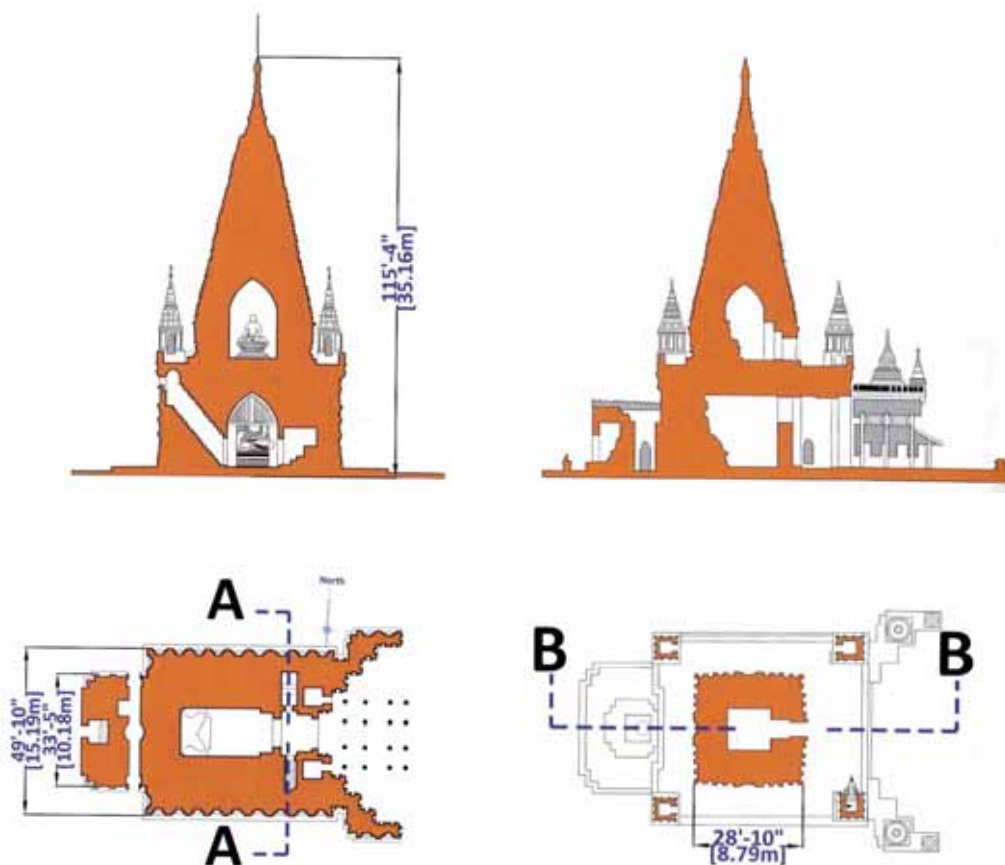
Ground floor plan, upper floor plan and cross section of Mahabodhi temple
